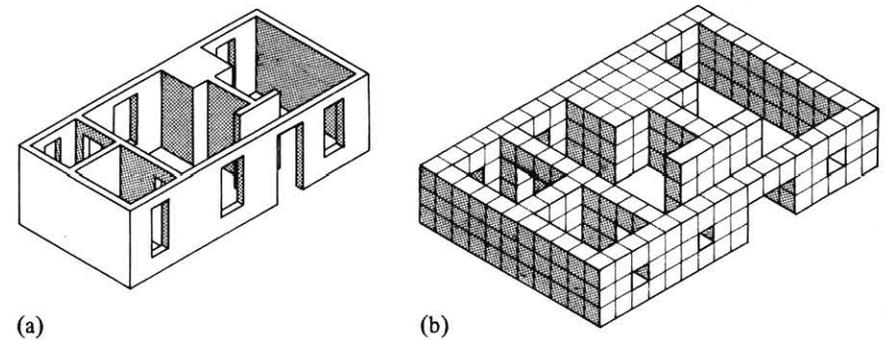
Solid form of the ground-floor arrangement of the ‘central fireplaces’ type house (a); and in dimensionless representation (b) within a lattice of cubes.
